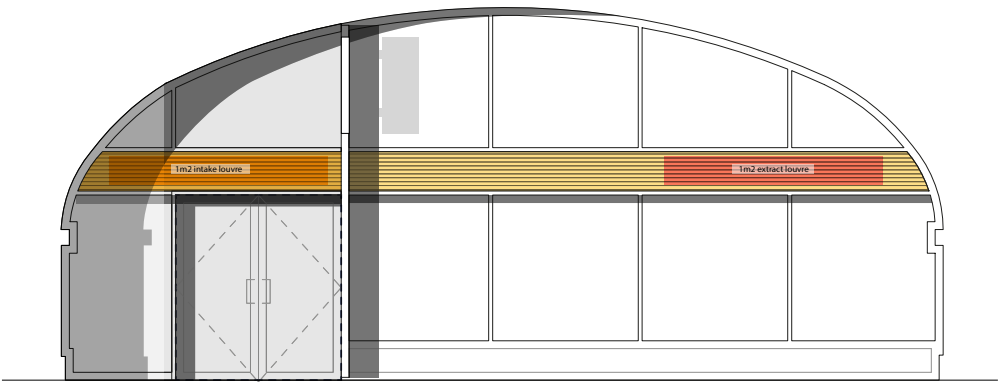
Elevation: Designated louvre zone for a typical A1 (food business) shopfront
